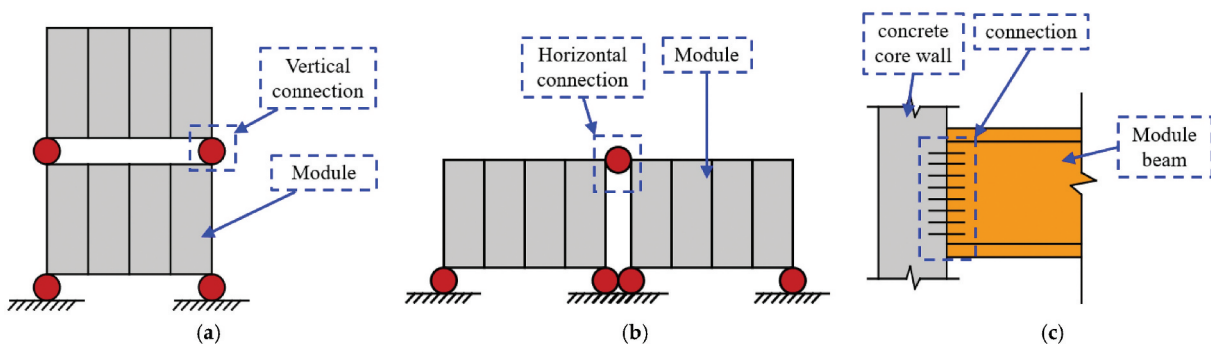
Connections on modular steel building. (a) Vertical connection; (b) horizontal connection; (c) modular-to-concrete core connection (Adopted from Yang et al. 2023).
